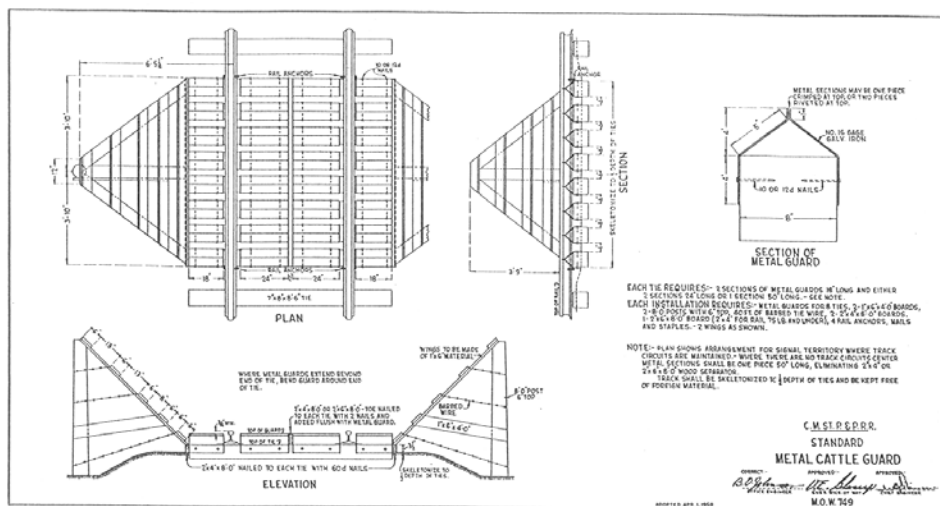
Standard Milwaukee Road cattle guard (author's collection).
